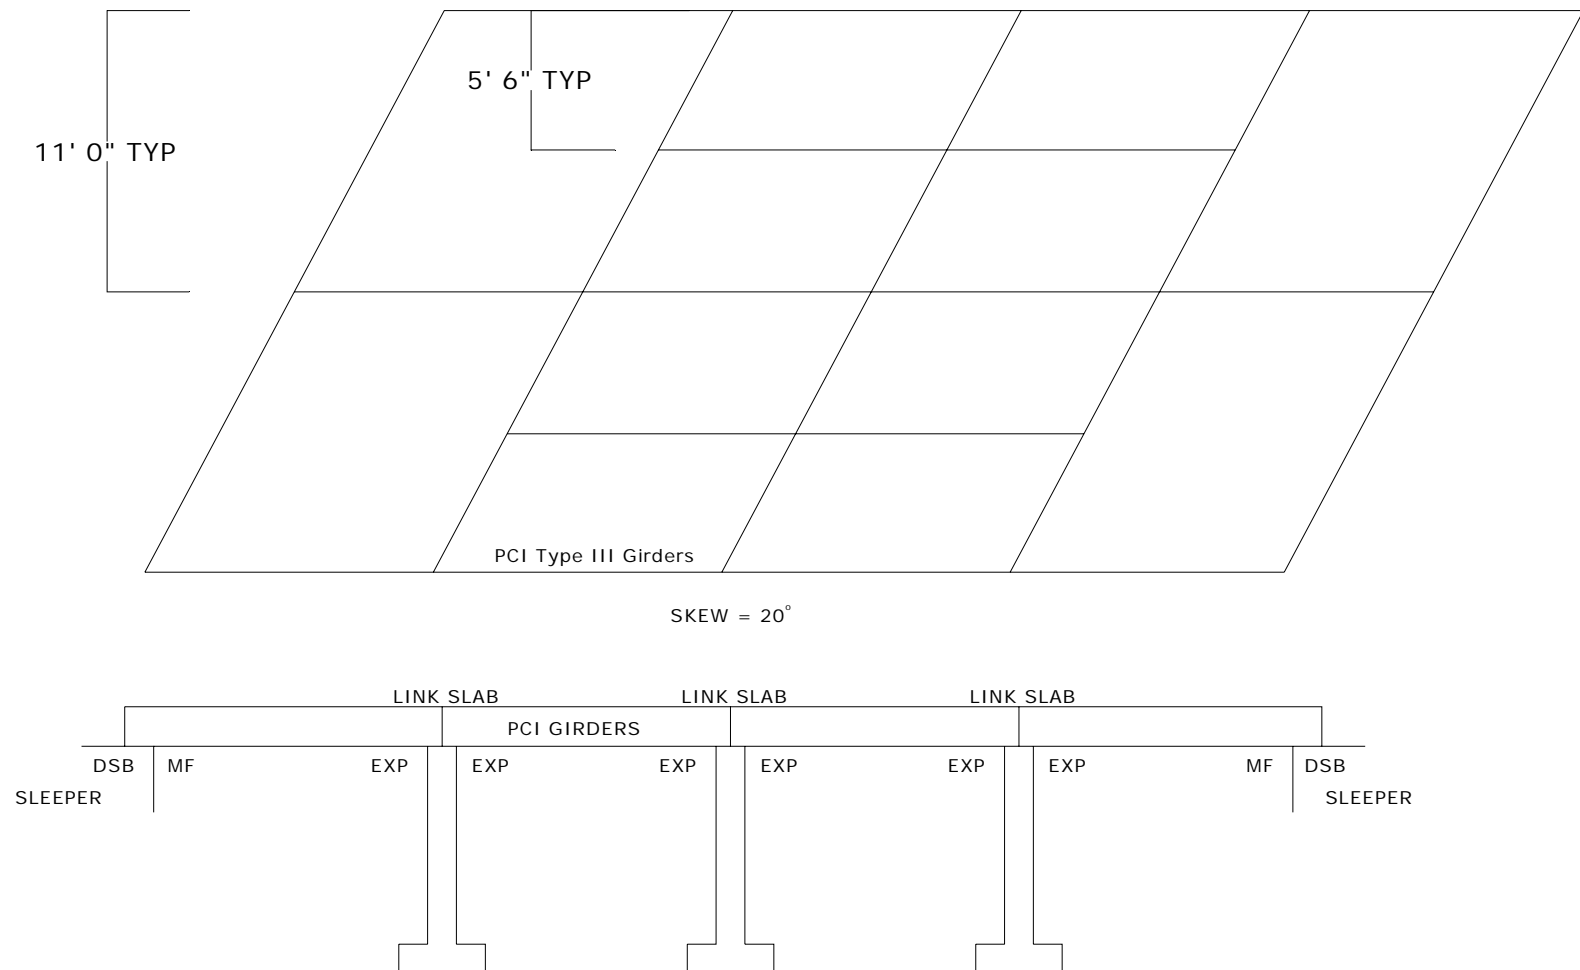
Plan and elevation of S04-1, 2 of 63174
